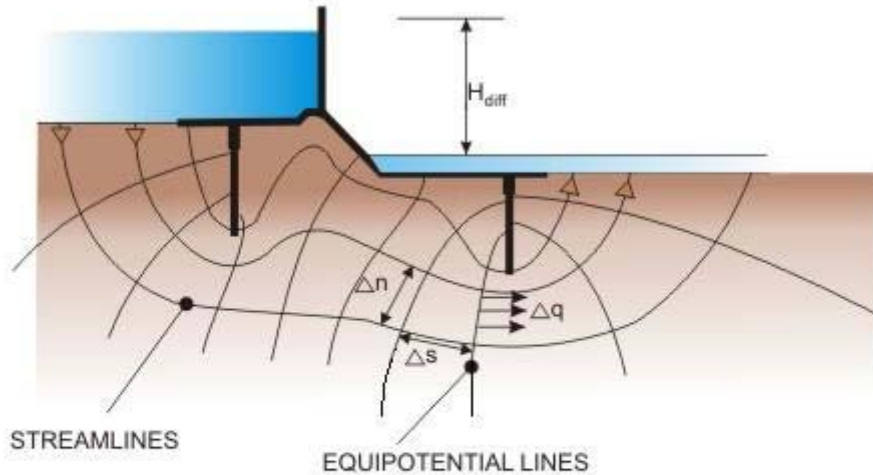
Streamlines and equipotential lines below barrage floor and sheetpiles
